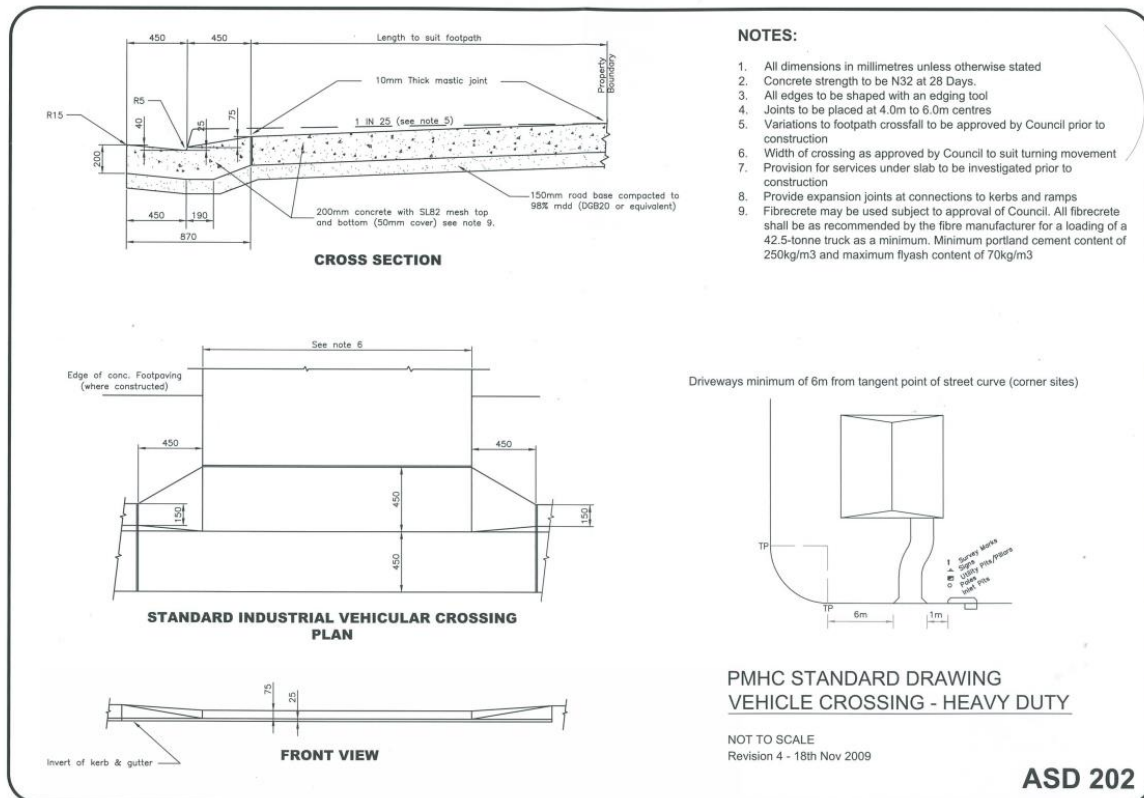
Driveway Slab to Proposed Residential Flat crossing Pacific Drive Road Reserve
